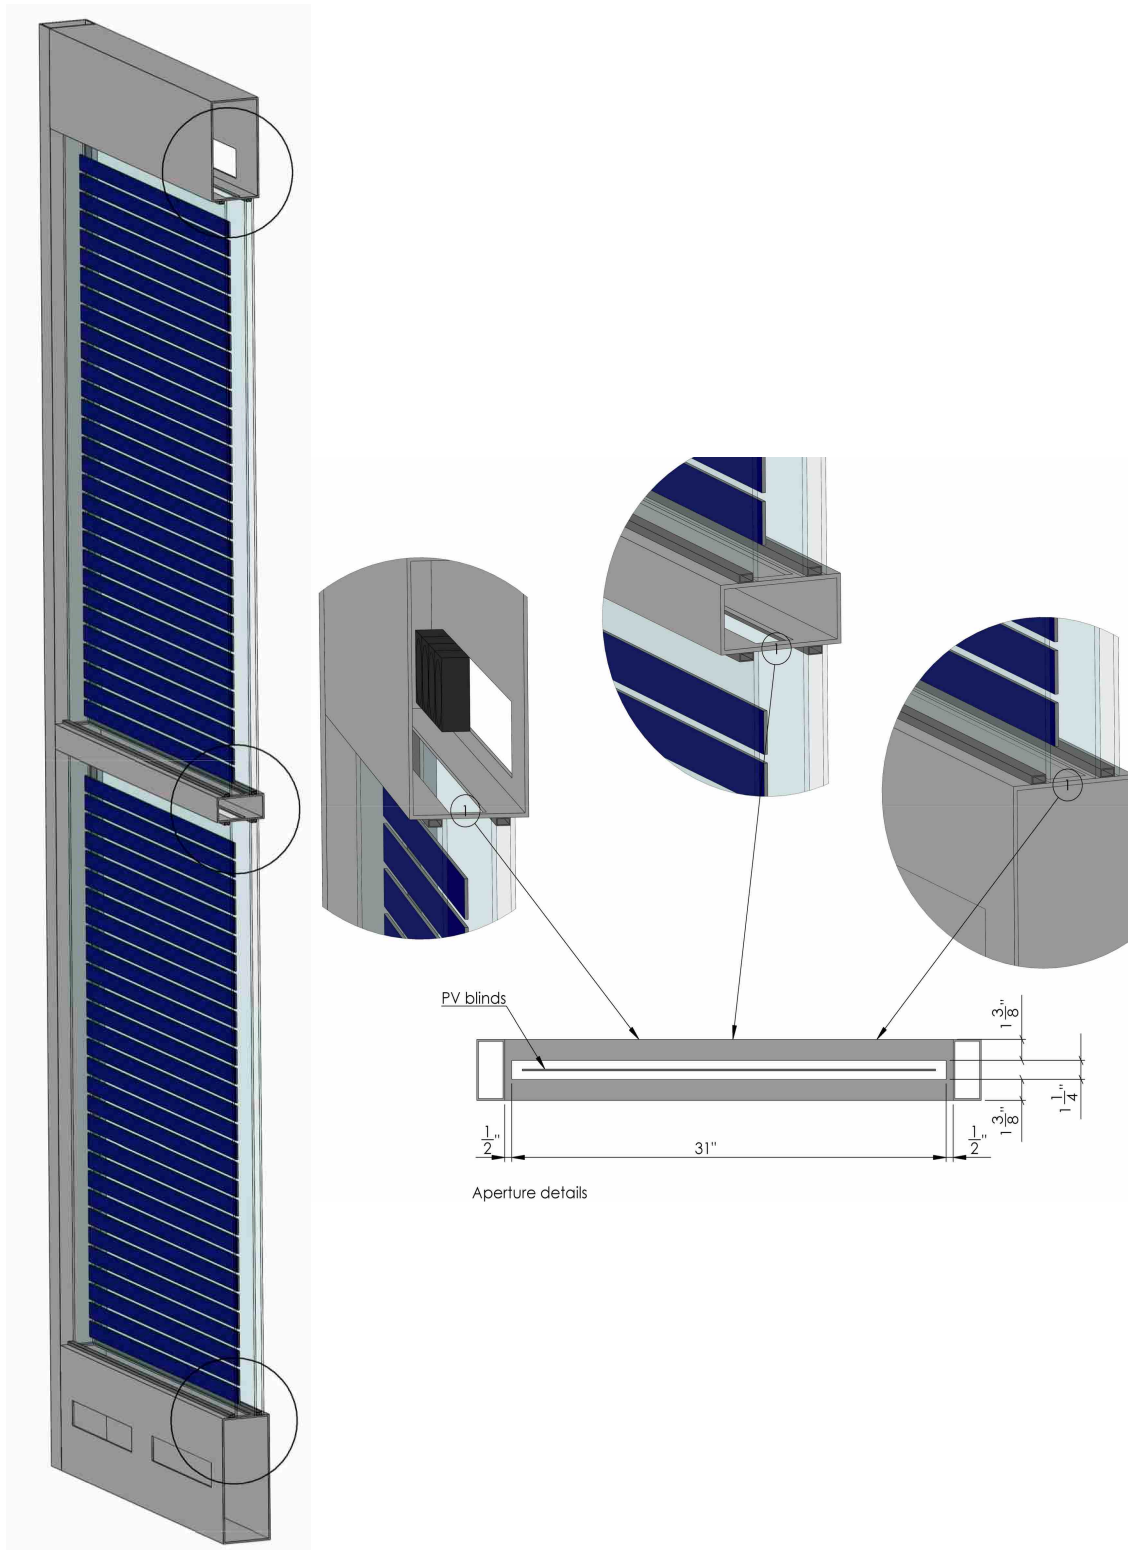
3D cross sectional view and close-ups showing the frame openings.
